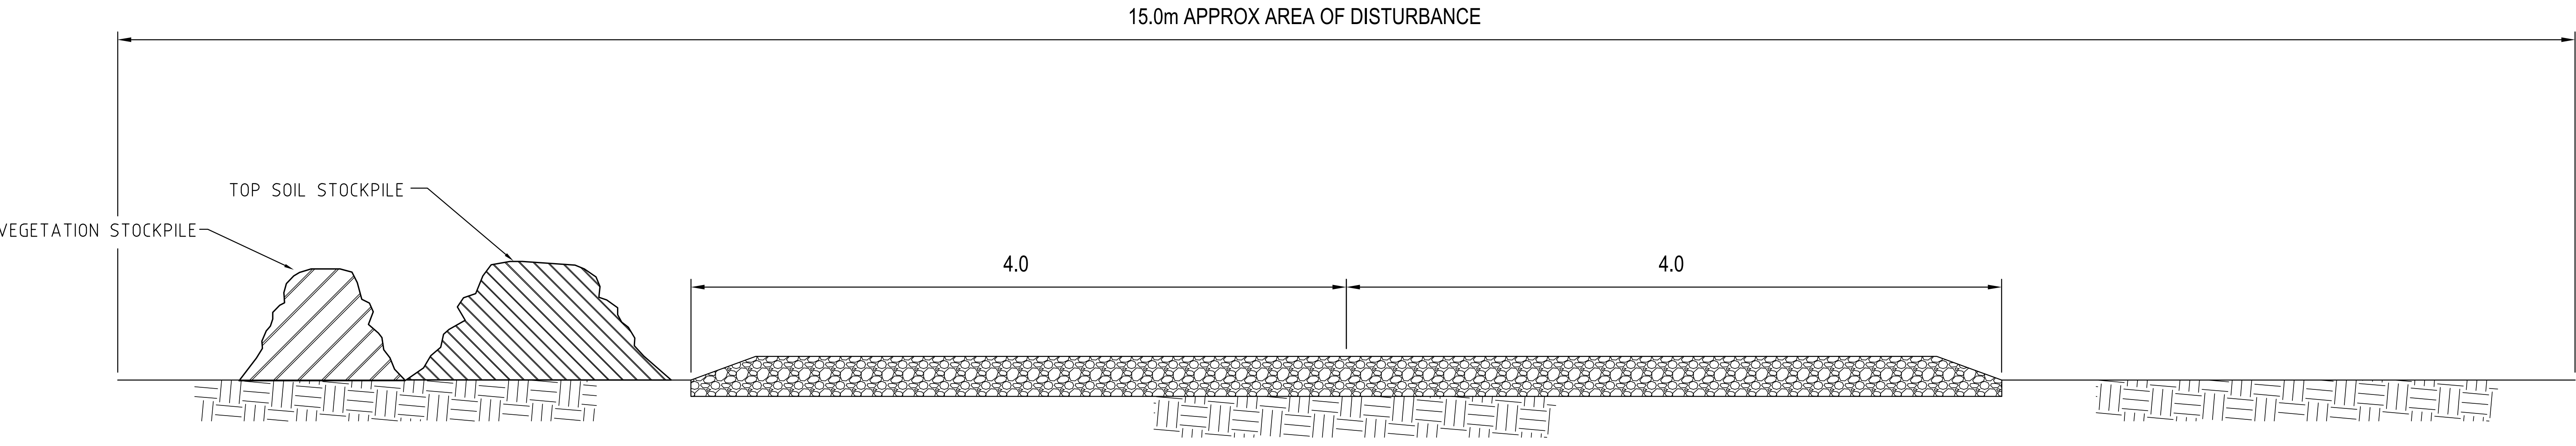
IMPORTED GRAVEL SHEETED ACCESS TRACK LAYOUT
